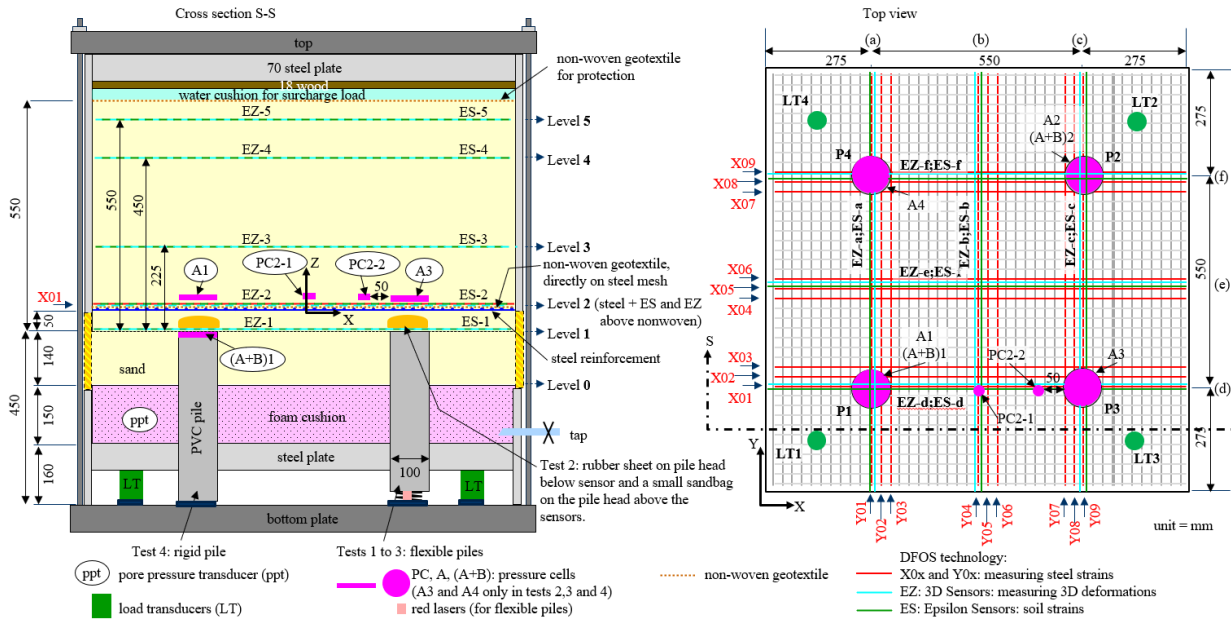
Test set-up small scale test steel-reinforced pile-supported embankments.
